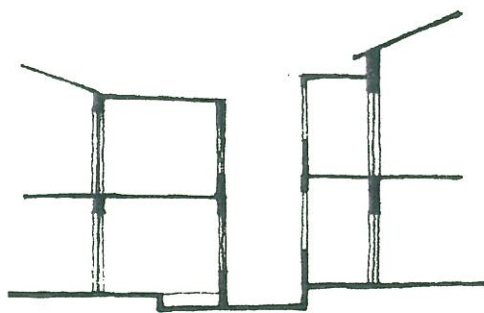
SECTION SHOWING POSSIBLE ENCROACHMENT
